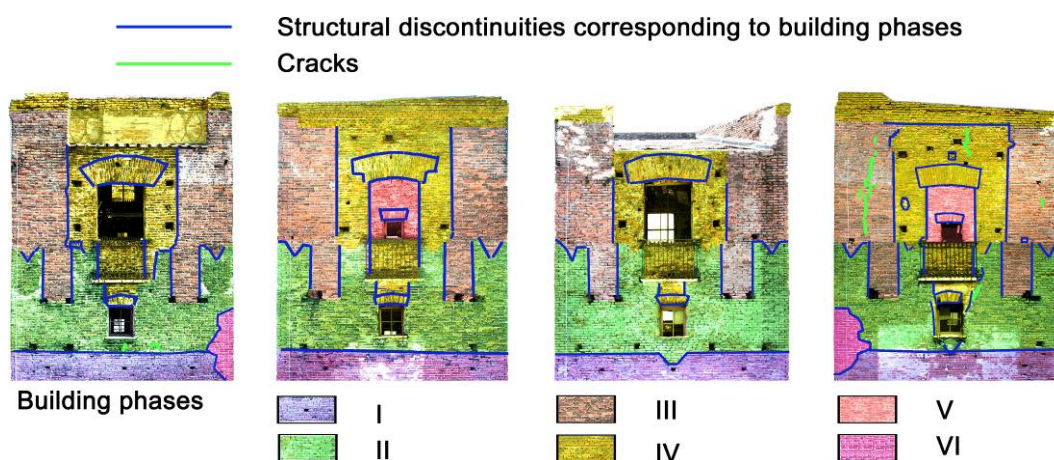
Structural discontinuities detected in the upper part of the tower and supposed building phases
